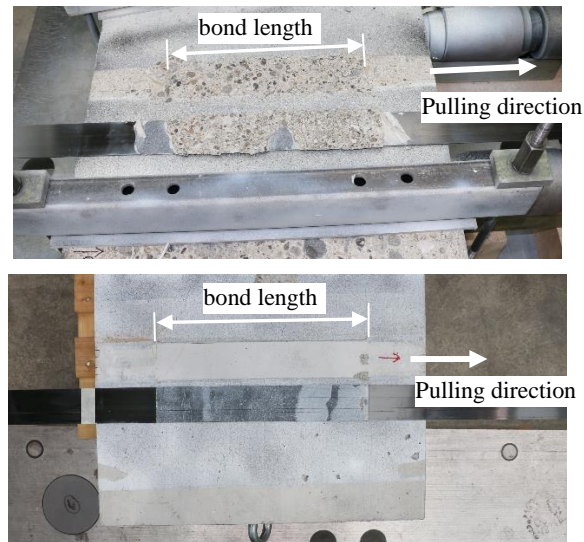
Failure modes: top: EBR-2: debonding failure in the concrete, bottom: EBROG-1: debonding failure in the adhesive layer.
